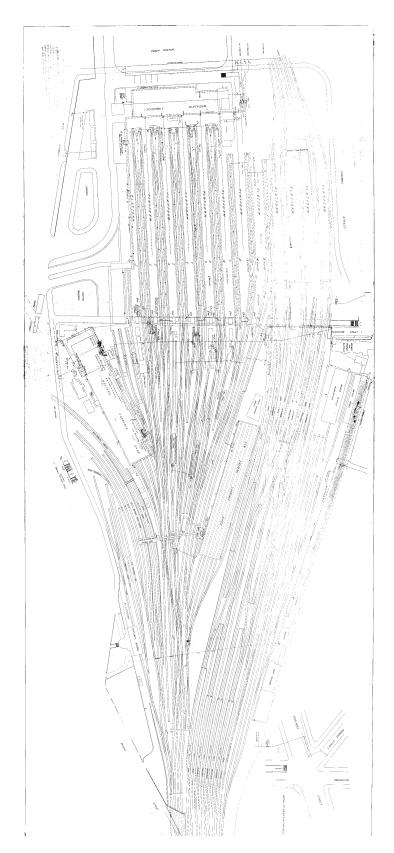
Dating from the late 1920s, this plan of Central Railway Station indicates the main station as built, plus the substantial eastward extension which accompanied the Central Electric services (Source: Sydney Trains Heritage Section)
